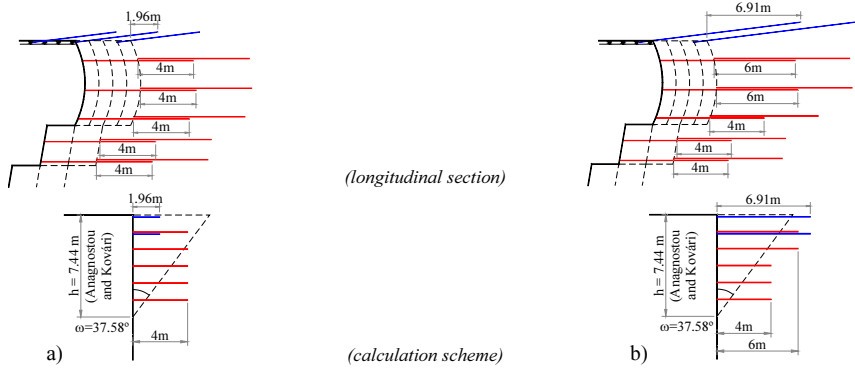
Soil conditioning for the station main tunnel: a) original design and b) design change [32].
